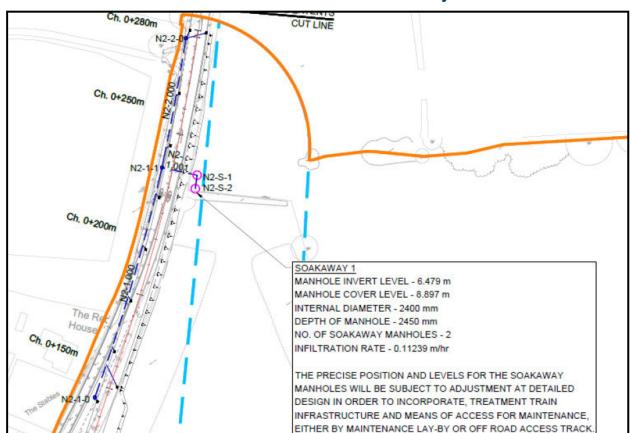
A12 west roundabout northern arm with soakaway manhole location
